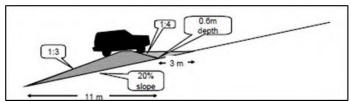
Whoa-Boys – Twenty Percent Slope – Importing Road Building Material – Cross-Section
